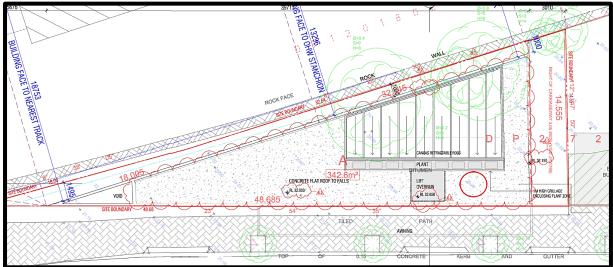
Overlay of the submitted Roof Plan and Survey Plan. The level closest to the mechanical plant enclosure (RL20.90) is circled in red.
